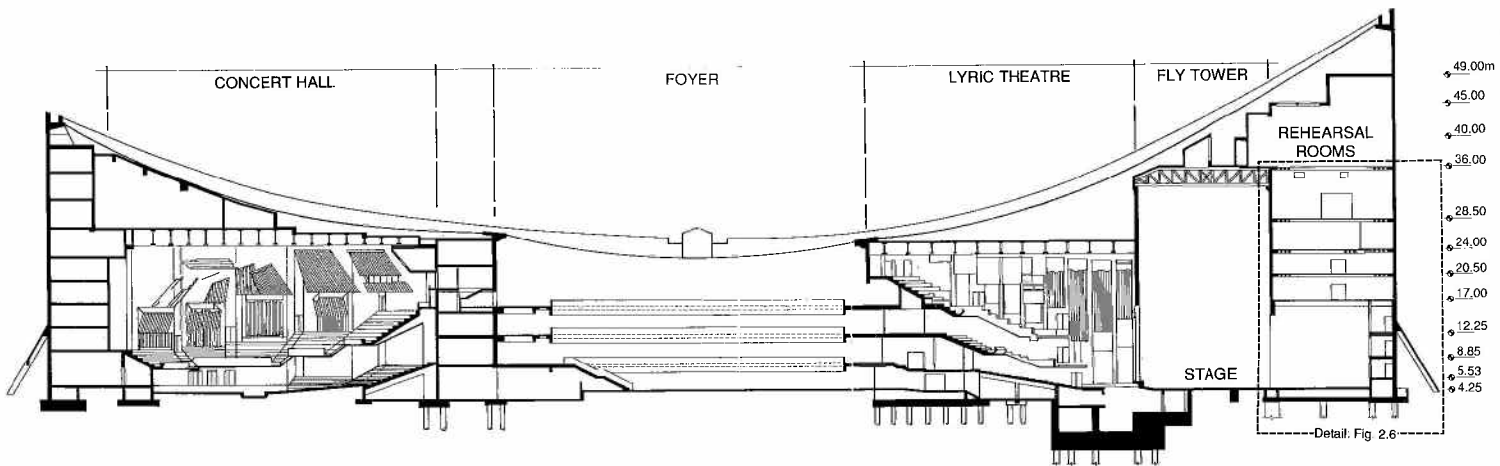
Section through Cultural Centre showing concert hall, foyer and lyric theatre
